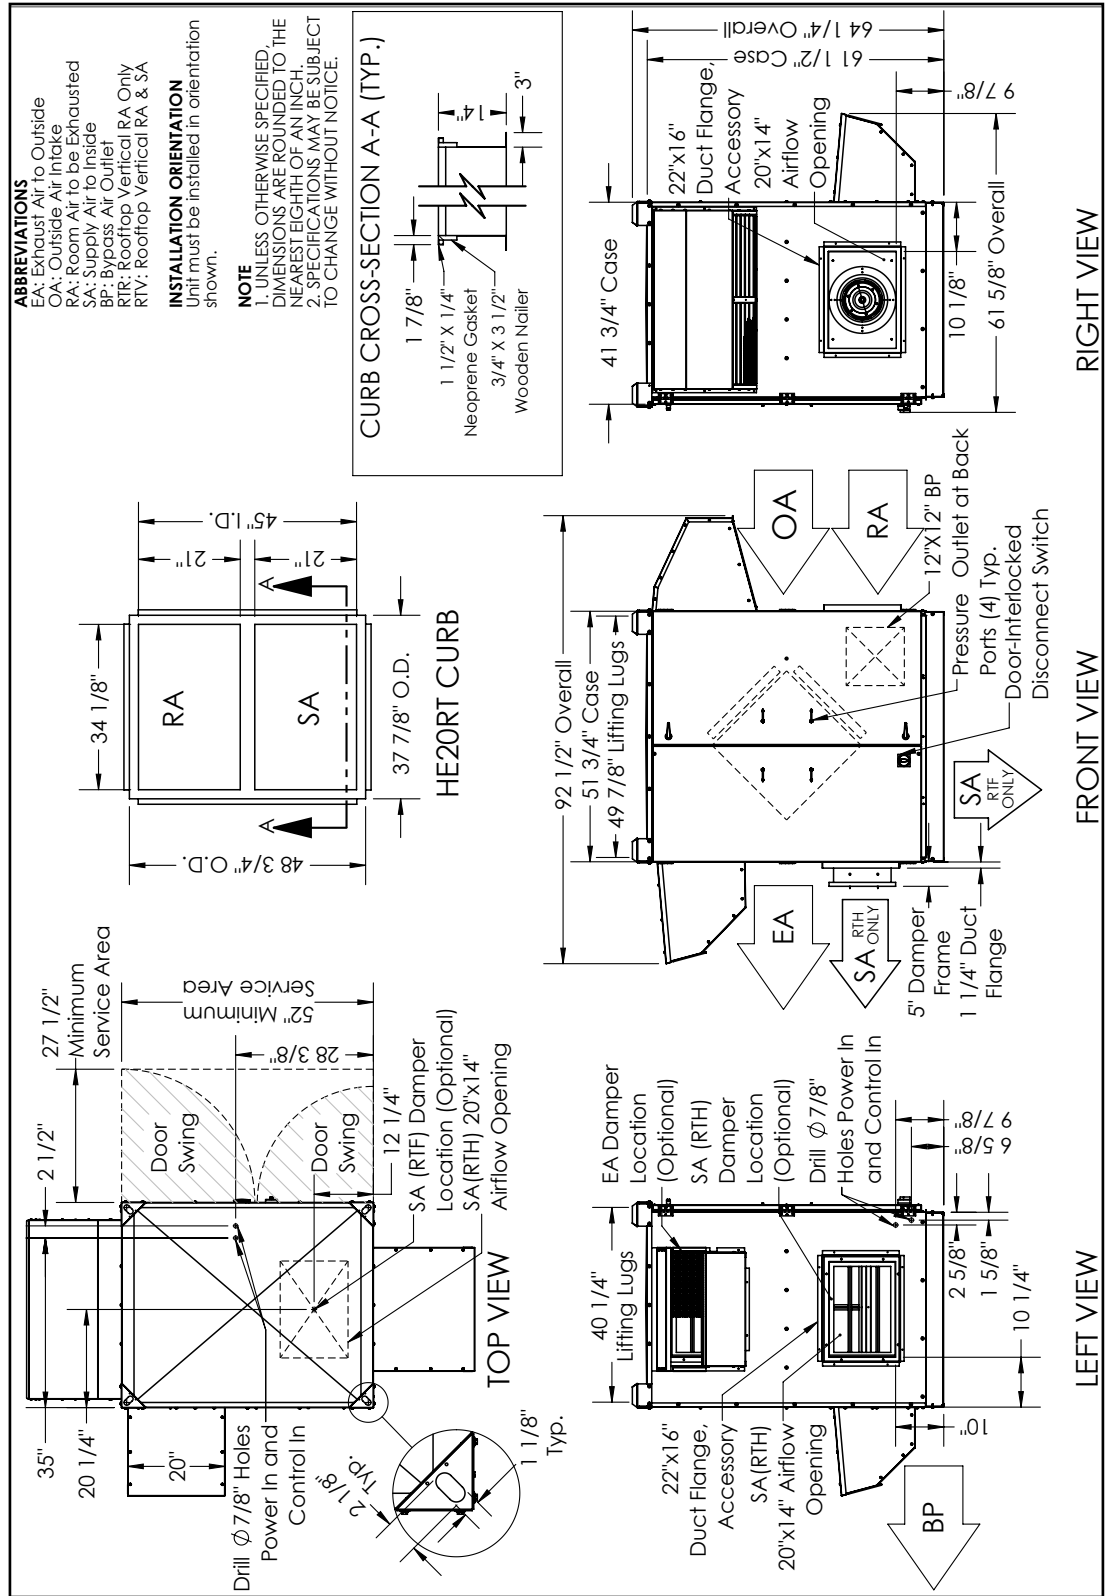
HE20RTF-H DIMENSION DRAWING (HORIZONTAL AIRFLOW ORIENTATION)
